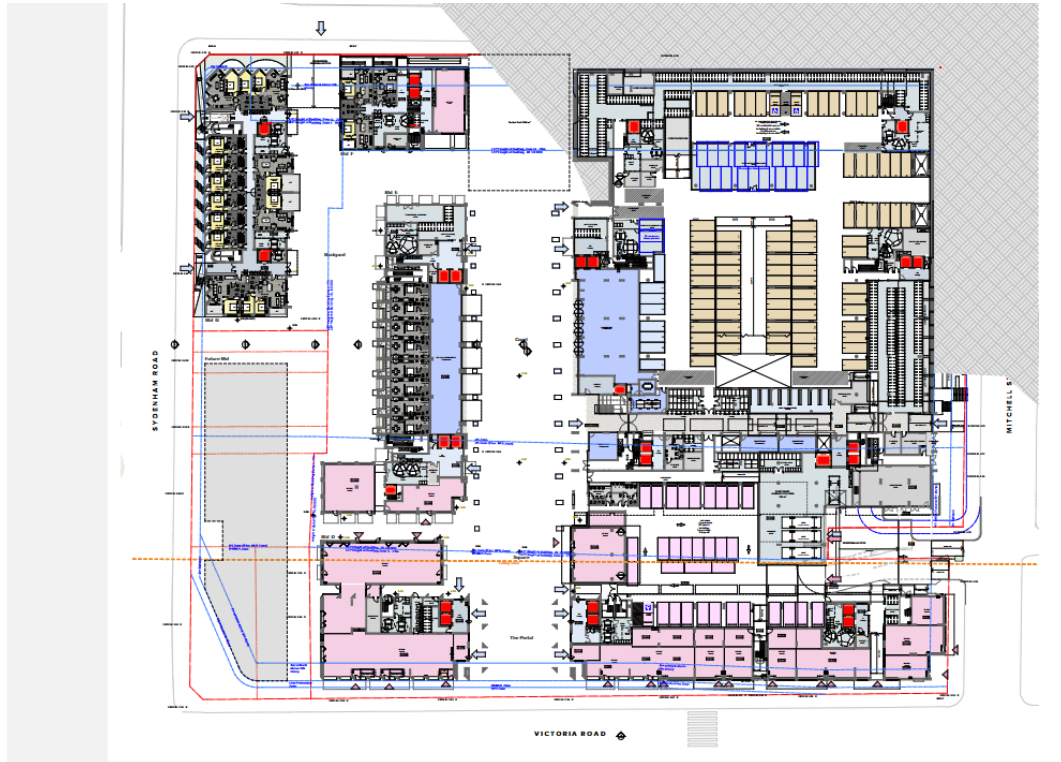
Extract of proposed plans showing ground level (Victoria Road).
